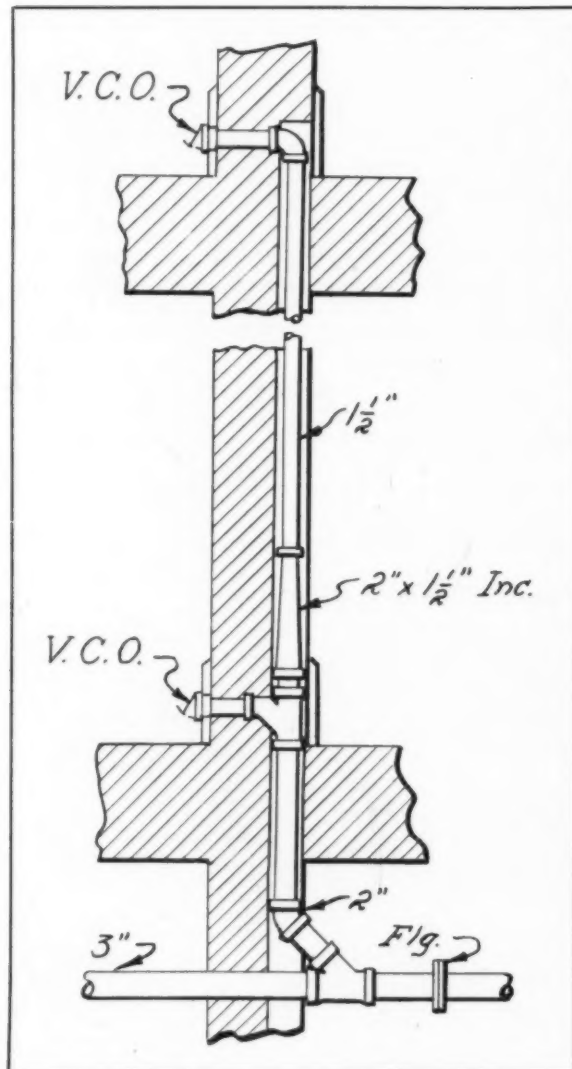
Connections for a Typical Central System Vacuum Cleaning Installation.
